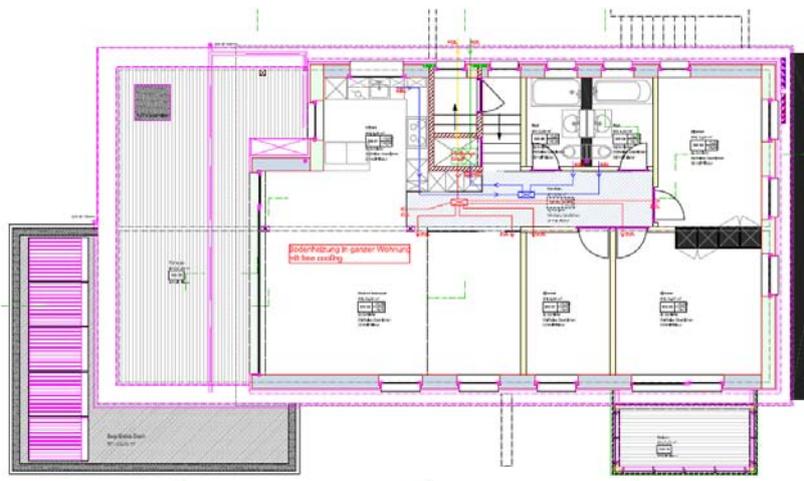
attic storey with decentralised ventilation unit located in the stairwell
